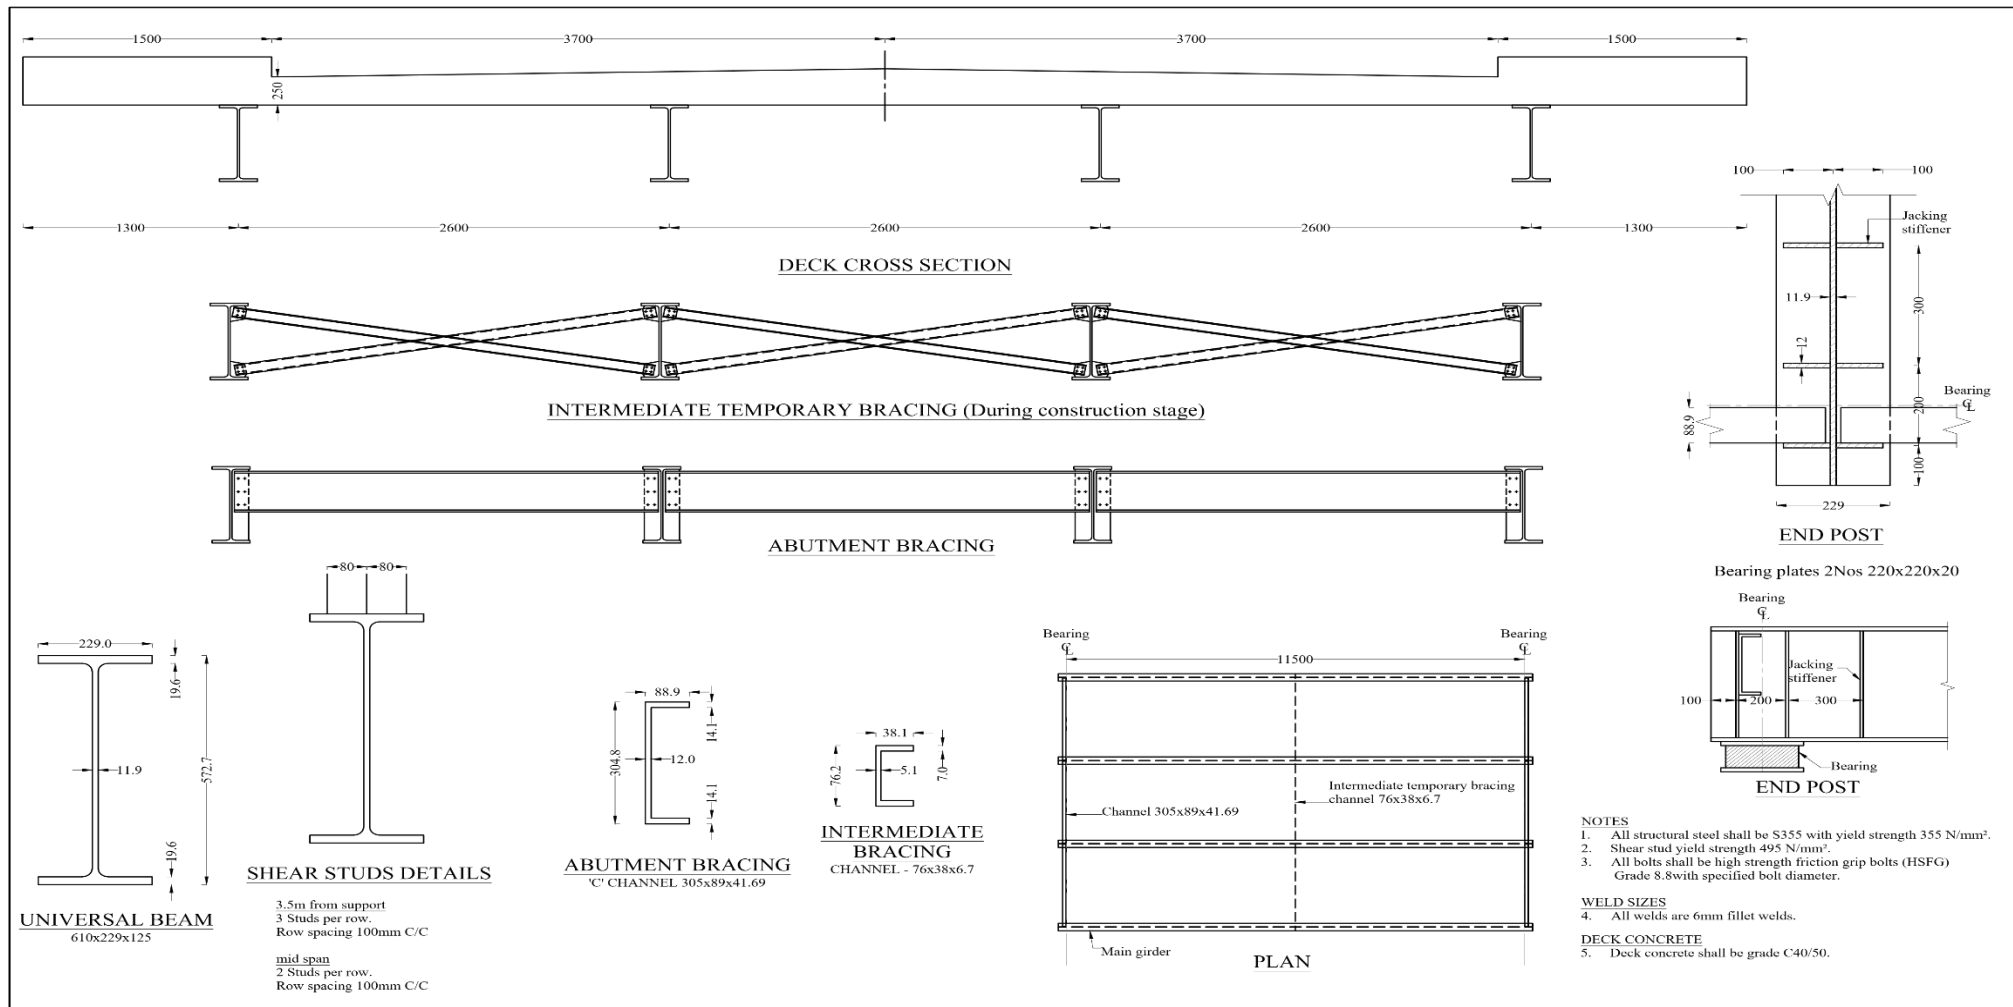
1 STEEL CONCRETE COMPOSITE BRIDGE DECK.SPAN 11.5m
